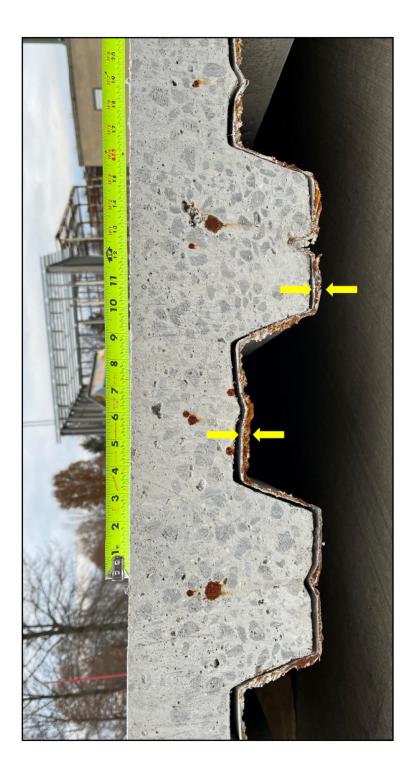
Typical cross-section of the composite floor showing the steel decking.
